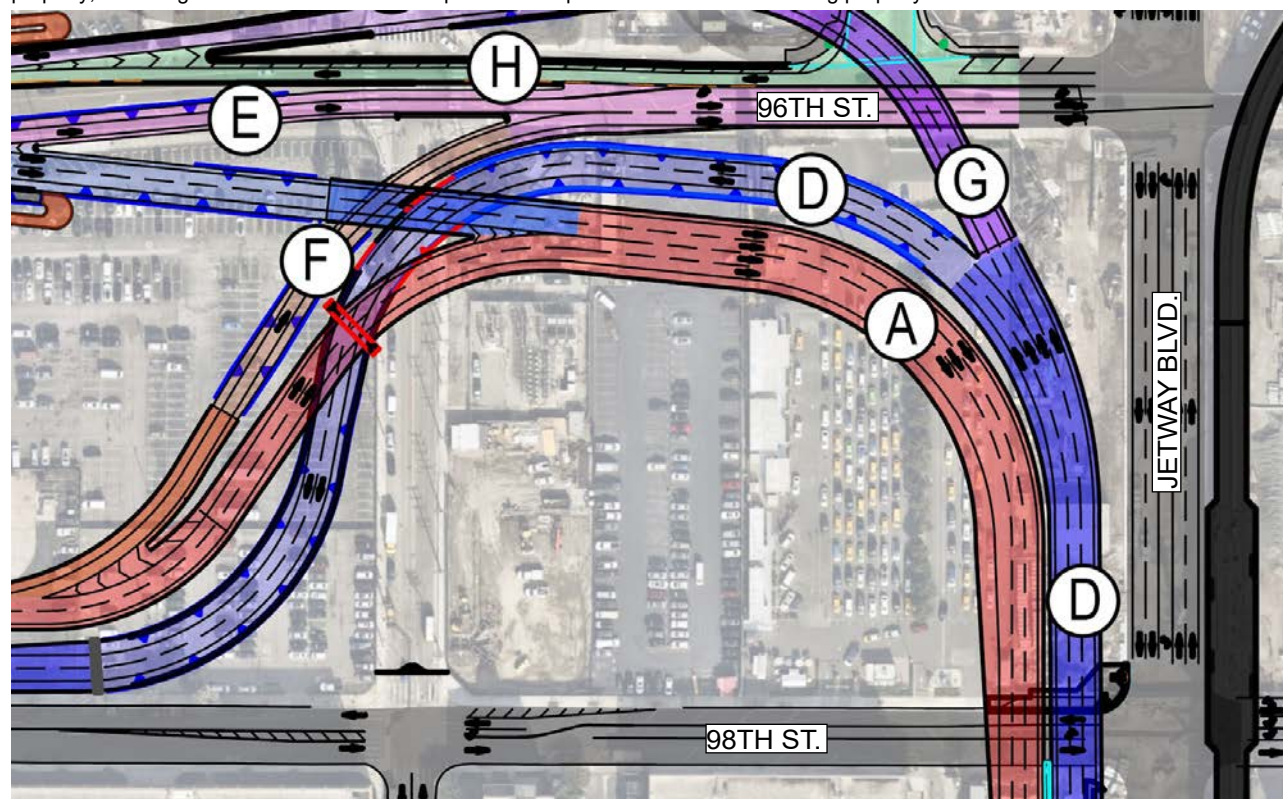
The connection from Segment G to 96th Street eastbound (via Segment F) under the Approved Roadway System, which would have also provided access to Jetway Boulevard, would be eliminated. Under the Proposed Roadway System Refinements, outbound access from the Central Terminal Area to Jetway Boulevard would be provided by Century Boulevard via Segments P and R, shown in Image 10.
